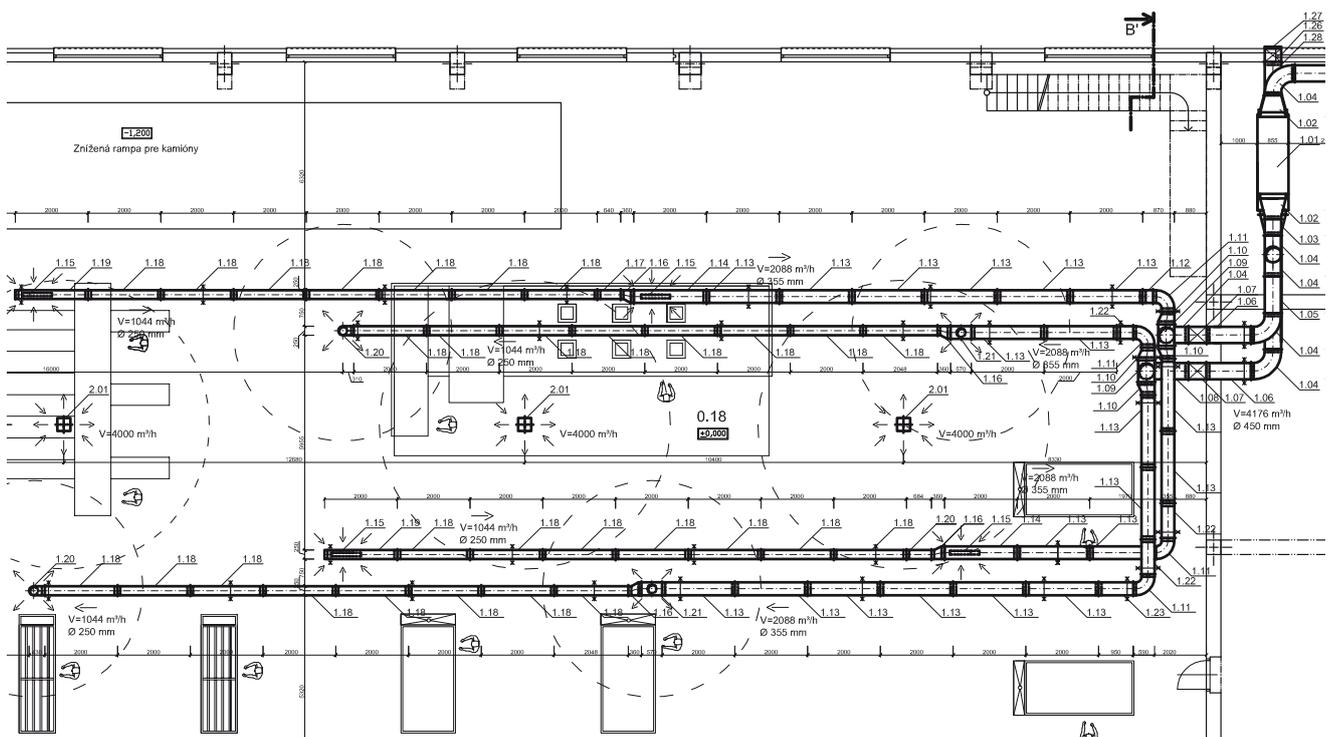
Central ventilation equipment – Plan of wood industrial facility hall. [13]
